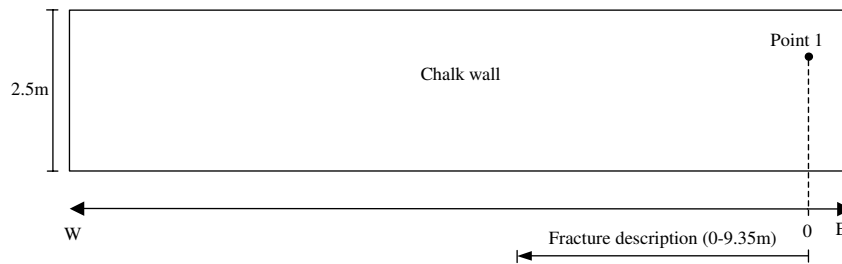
Sketch of the excavated chalk wall (2.5 m high and 25 m long).
